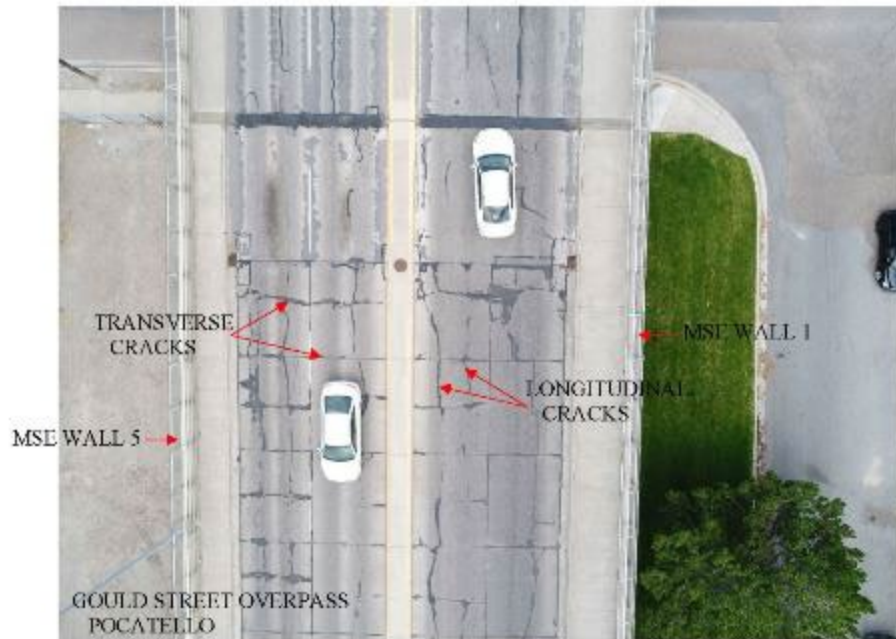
sUAV Pavement Survey above MSE Wall 5 along E. Gould Street Overpass
